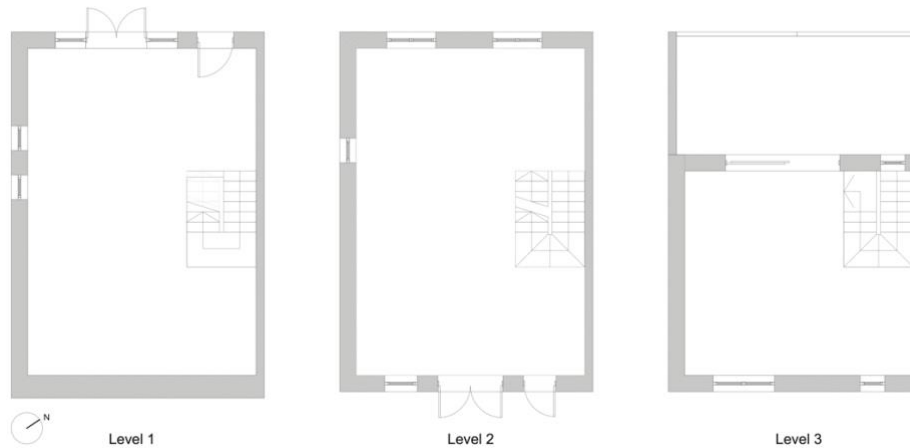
Case study building shell floor plan (Marshall and Kendon Architects, 2020)
